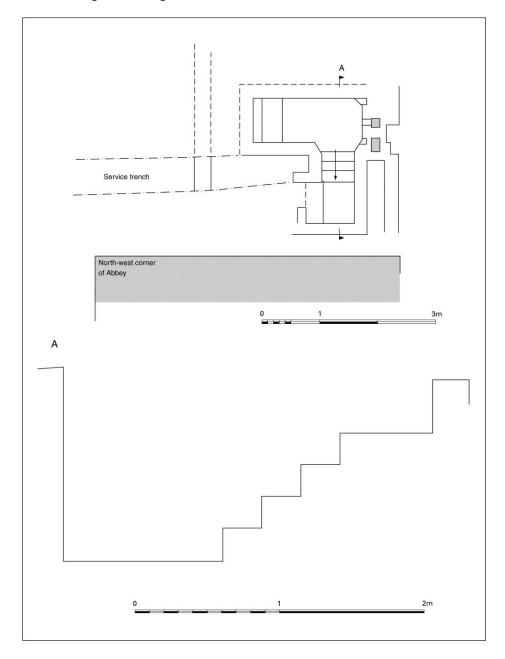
Location, plan and cross-section at A of the plunge bath; north to top (Andy Isham)
